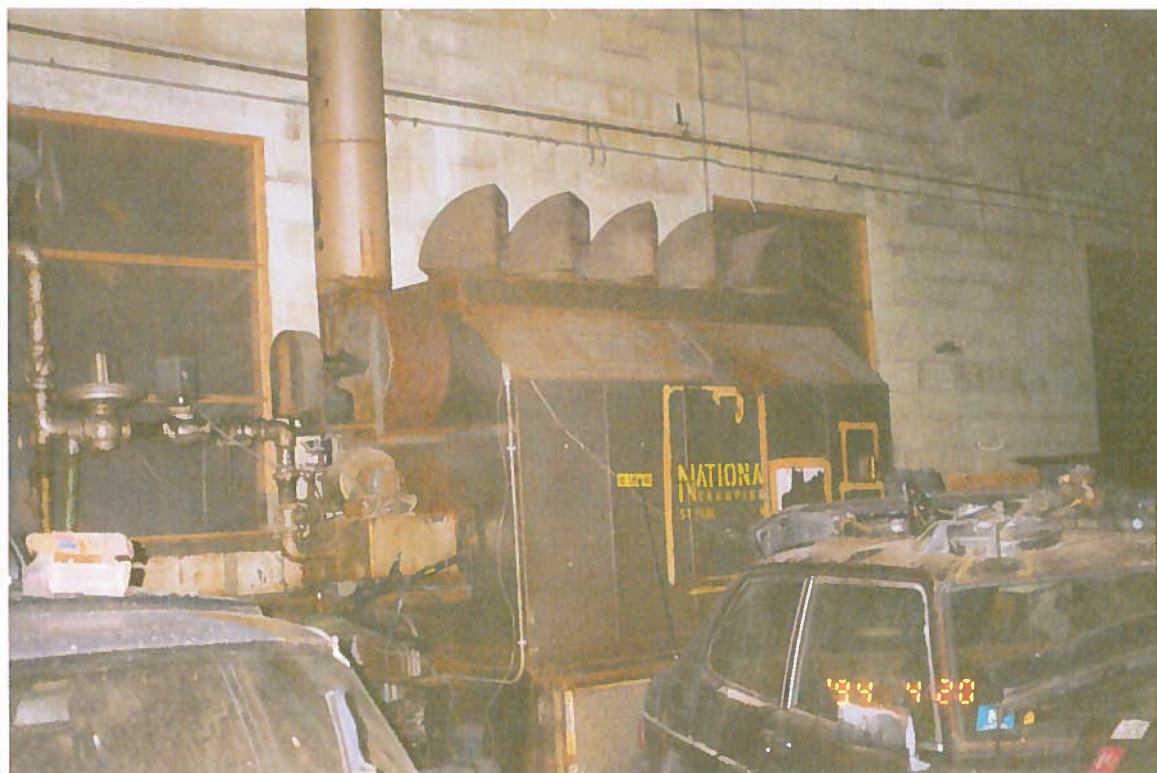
First Floor Main Warehouse (Vehicle Storage).
